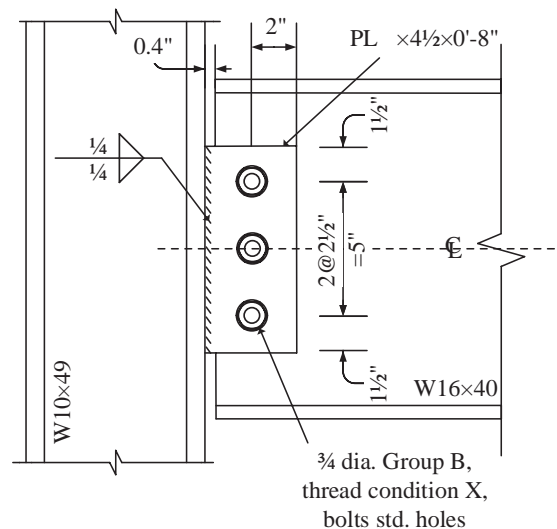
Detailed design for W16×40 beam connected to W10×49 column through a single-plate connection.
